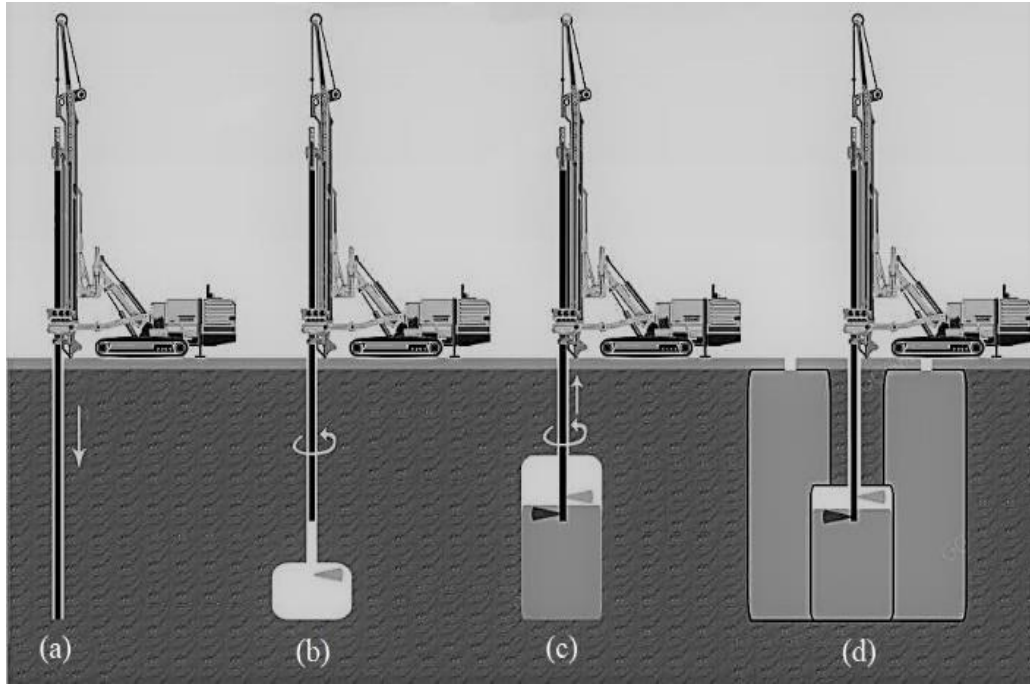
Process of jet grouting (a) drilling with water, (b) start high-pressure grouting, (c) execution of jet-grout column, (d) repeating for the next column (Taehwa, 2020)
